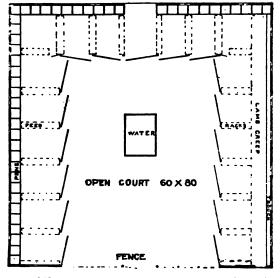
LAMBING SHED FOR THE SOUTH (FLOOR).
